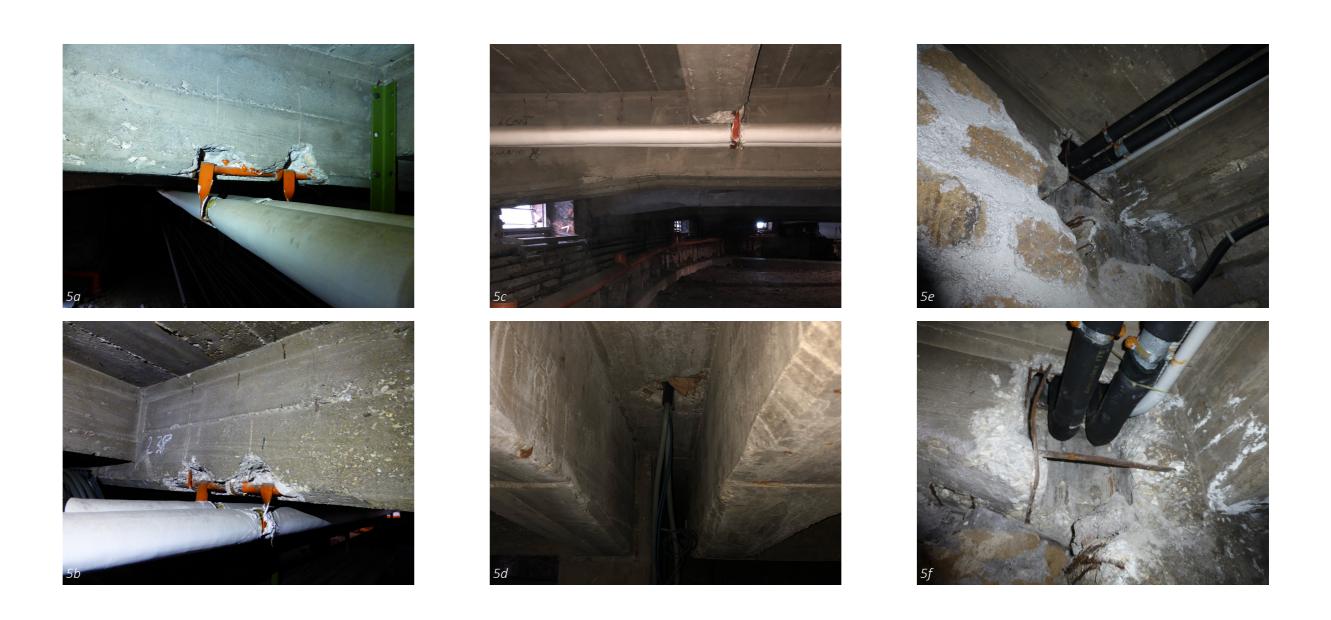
a/f - East curved wing, basement level: a) pipes hanging on longitudinal reinforcements (© Liberatore 2020); b) stirrup oxidation, pipes hanging on longitudinal reinforcements (© Liberatore 2020); c) stirrup oxidation, pipes hanging on longitudinal reinforcements (© Martella 2020); d) hole in the reinforced concrete slab for the passage for cables (© Martella 2020); e-f) hole in a reinforced concrete beam for the passage for pipes (© Sorrentino 2020).
